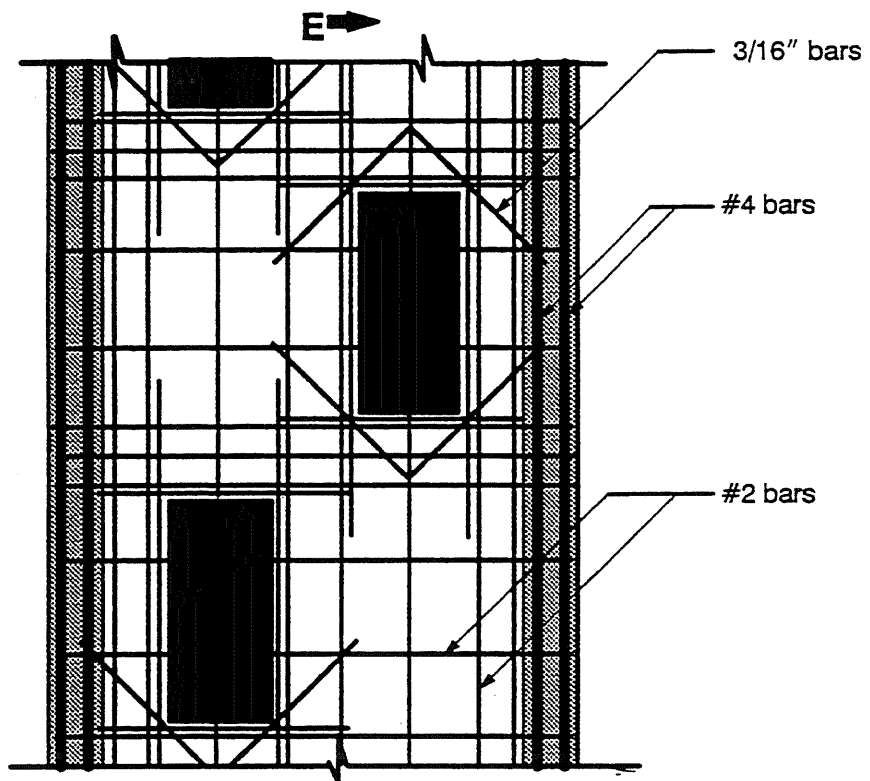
Reinforcement Details for Wall W1: Cross Section
